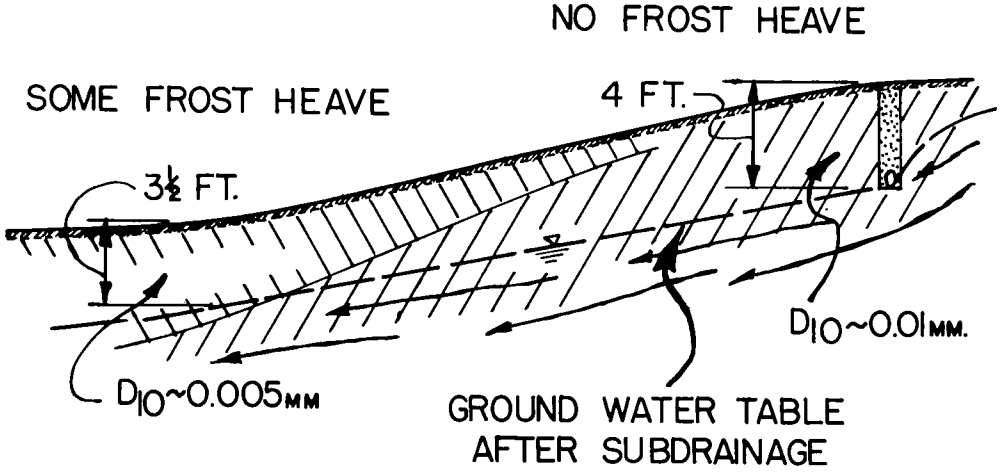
Centerline section at subdrain Site 2 showing the transverse cut-off subdrain and resulting ground water table. Frost heave conditions during the following winter are also shown.
